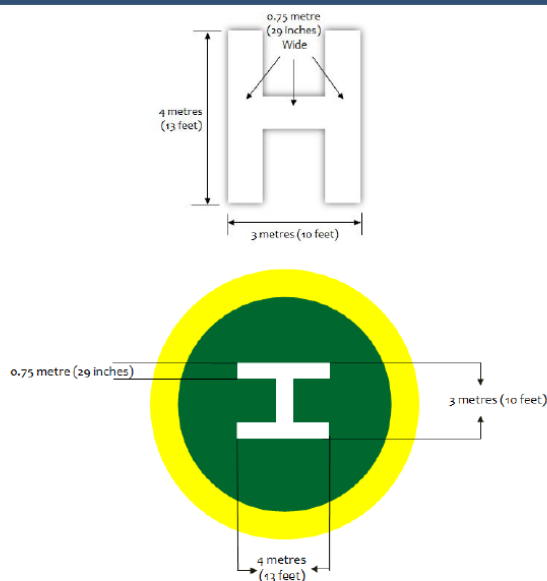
Dimensions of the heliport identification "H" marking (standard size)
